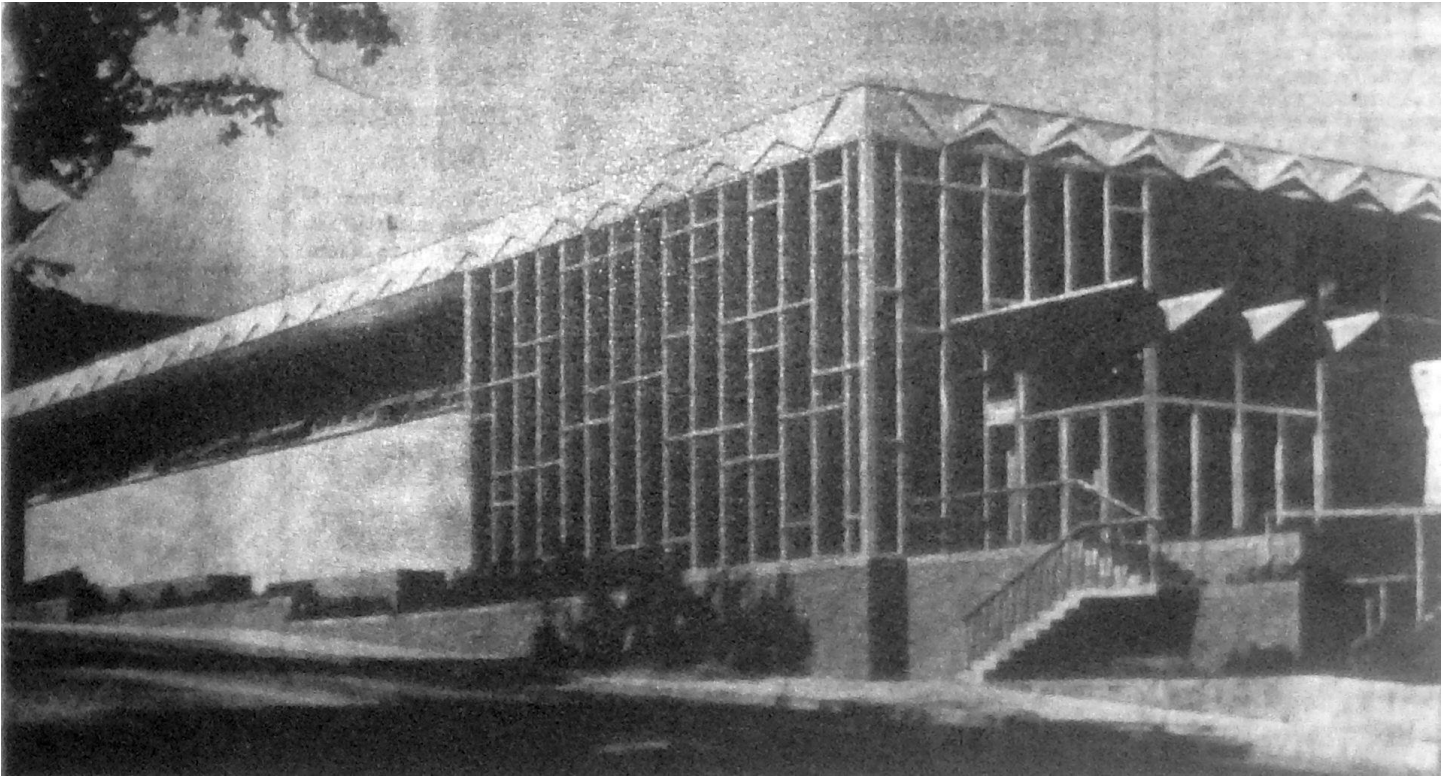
Construction photo, looking northeast (Davenport *Democrat and Leader*, August 2, 1963)
